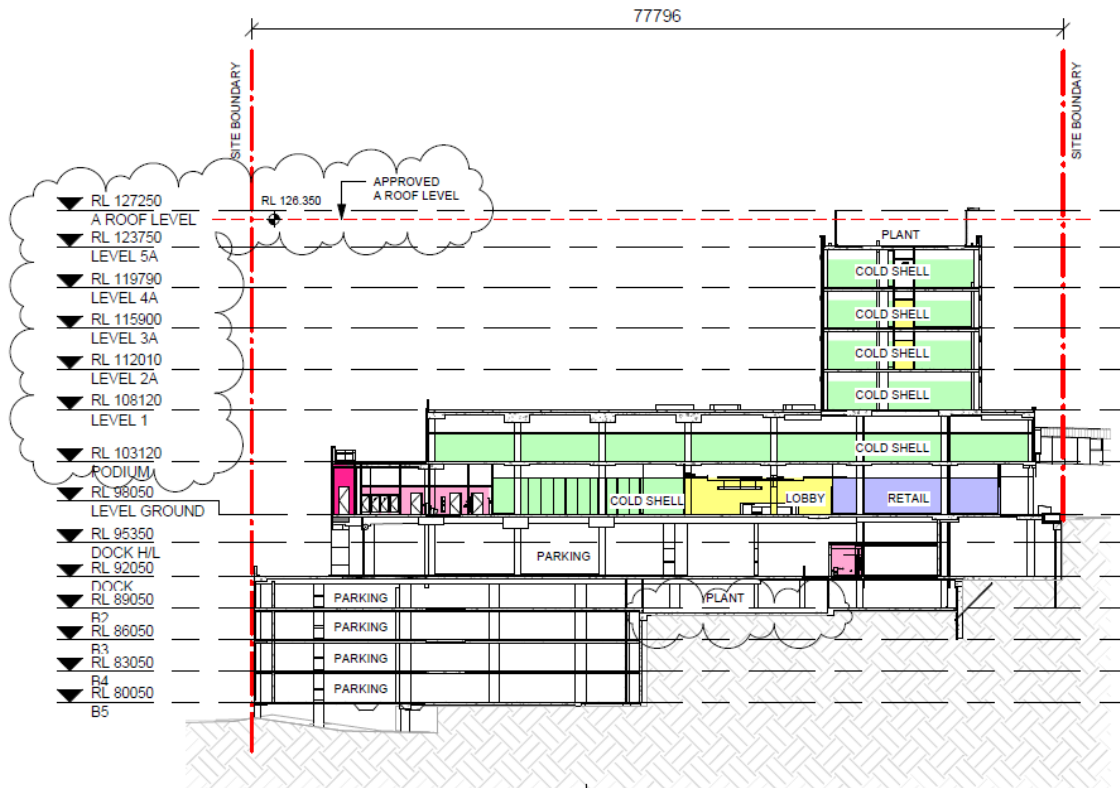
Proposed changes to Tower A (SSD 7543) (Source: Billard Leece Partnership)
